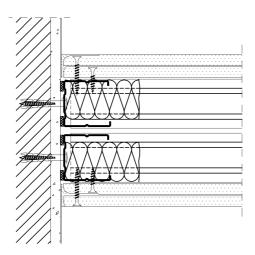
Sectional drawing of metal stud partition W115, Source: www.knauf.de
